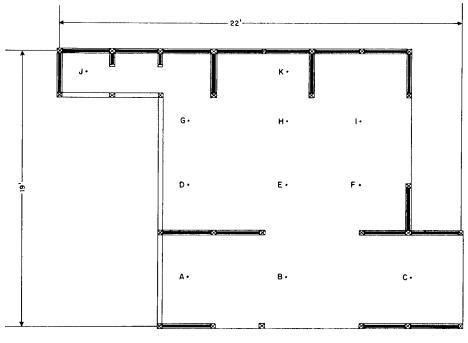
Floor plan of upper floor of house type B showing station locations.
